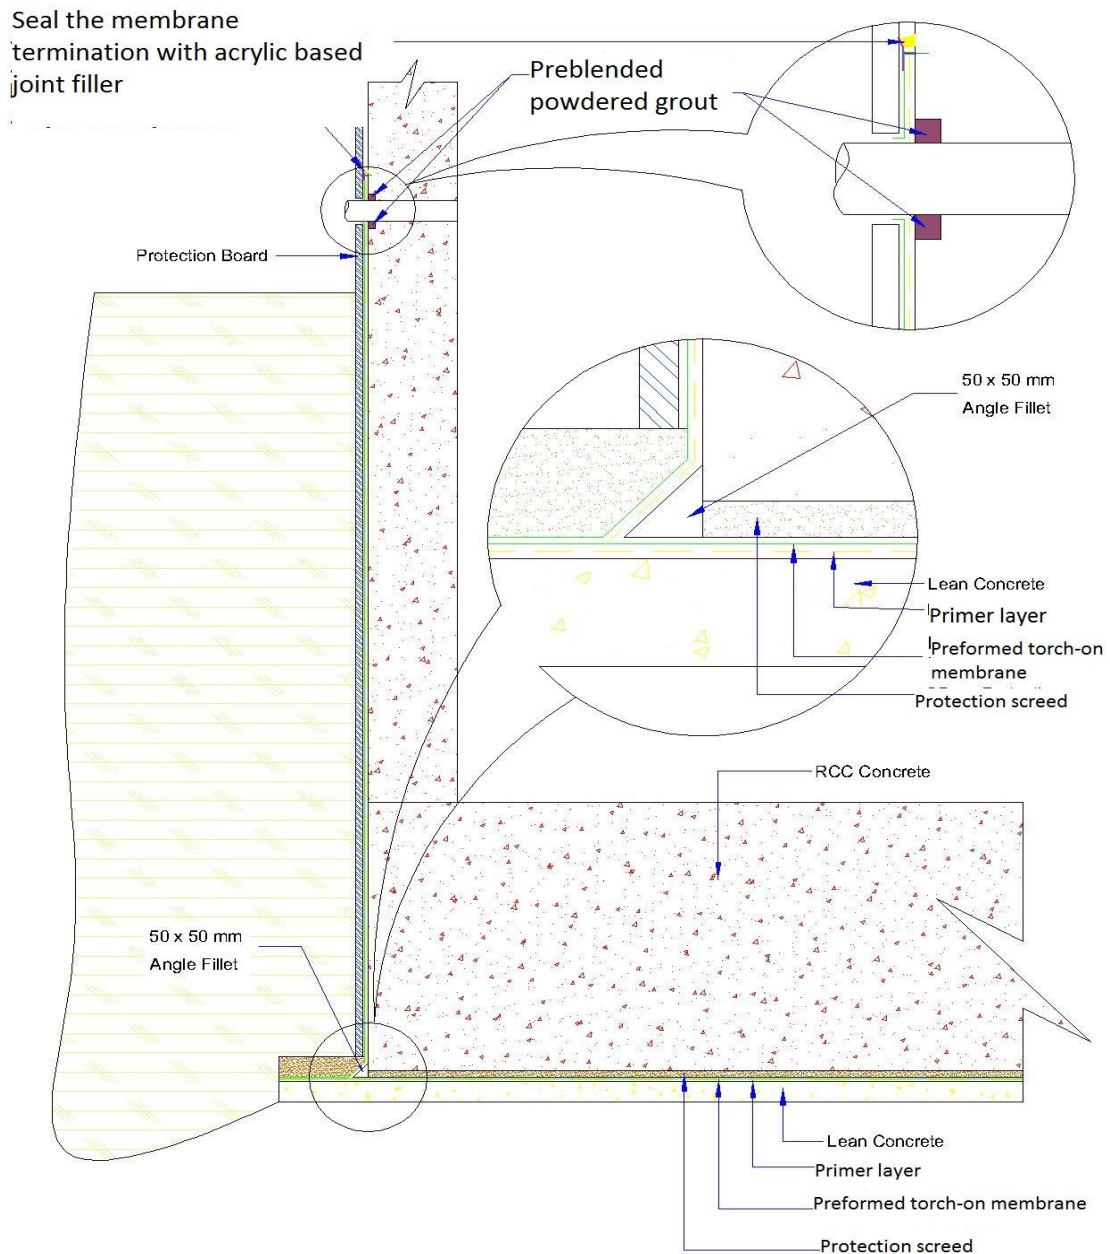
External Waterproofing of Basements, Underground Sumps, Swimming Pools, Lifts, Tanks and Reservoirs
